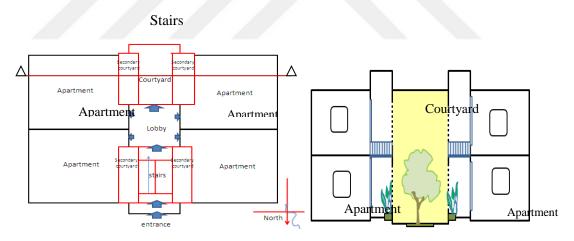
Plan of the design solution –section in the courtyard .The building was analyzed according to ventilation, cooling, heating, lighting, privacy and safety, as shown here.
